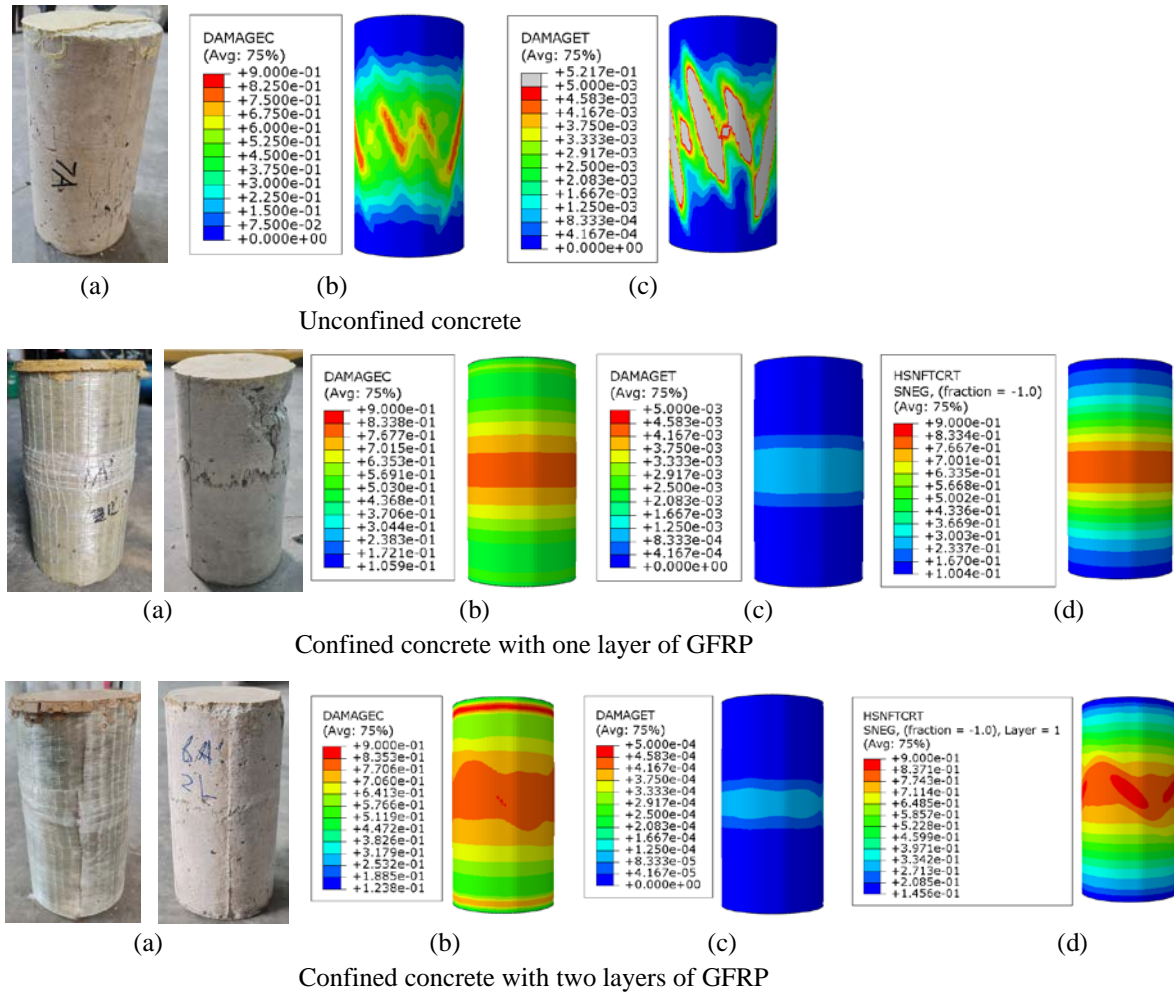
The failure mode of unconfined and confined concrete: (a) experimental, (b) compression damage of concrete (numerical), (c) tension damage of concrete (numerical), and (d) tension damage of GFRP (numerical)
